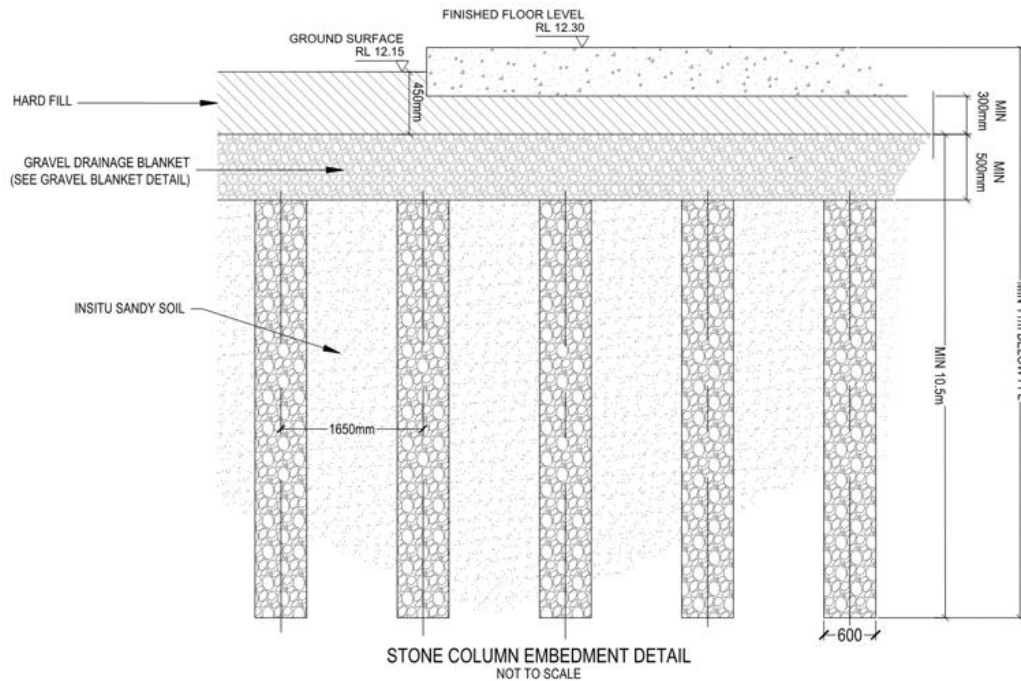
Typical stone column detail at the Woolston Fire Station site.
